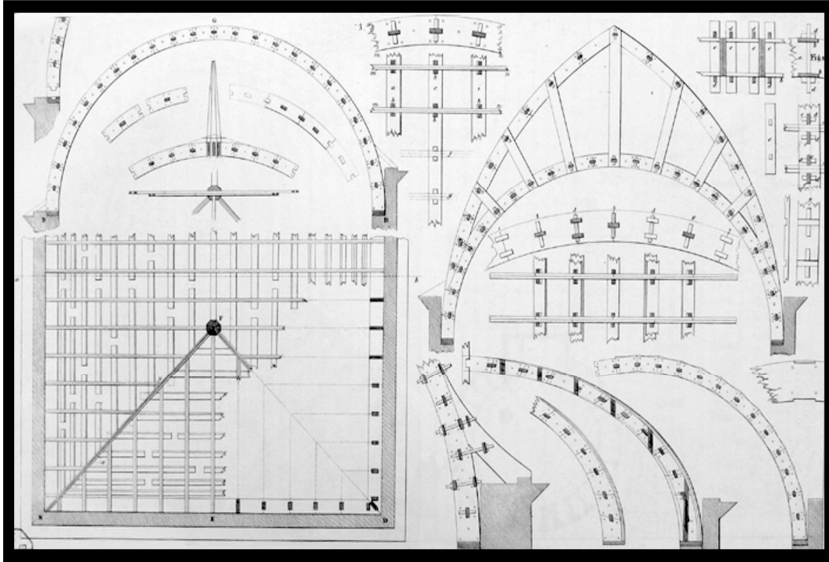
Plan, sections and details of de l'Orme's system (Emy, 1856, reference plate: 102)
